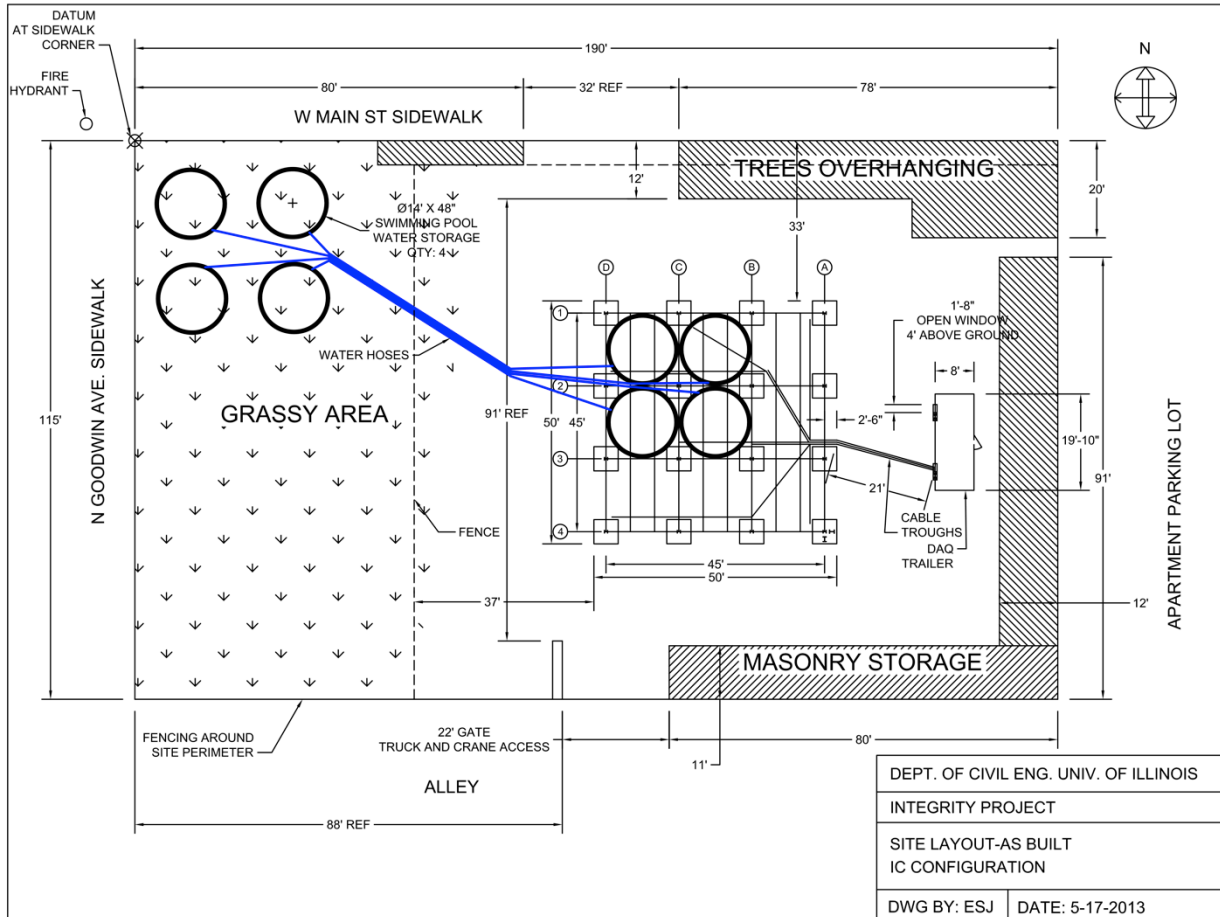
Test Site Layout with Loading Pools Arranged for the Interior Column Test
